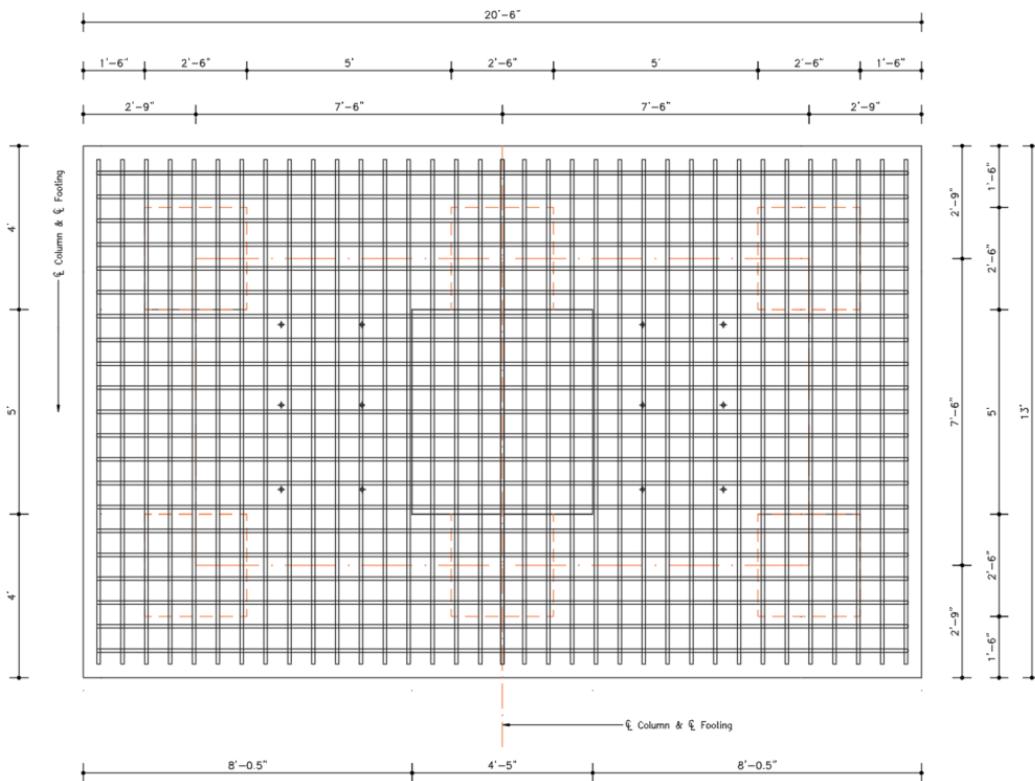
GFRP reinforcement layout (top reinforcement) – Pile cap 6-pile group “B” of the selected Pier n.24 of the Eastbound Bridge
